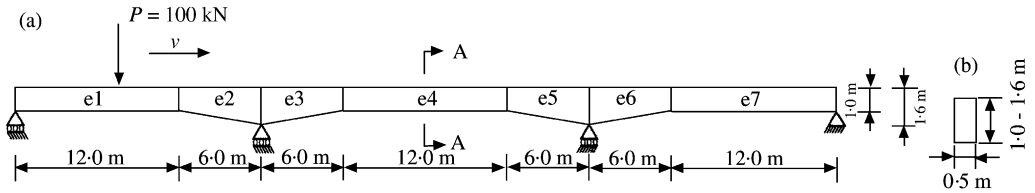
A three-span continuous haunched beam under a single moving load: (a) elevation; (b) section A-A.
